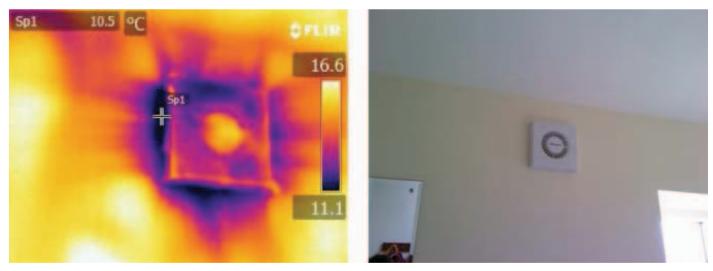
White House Farm, Stirton, Skipton. Ground floor cloakroom extractor fan showing poor connection between the base of the cover plate and wall.
